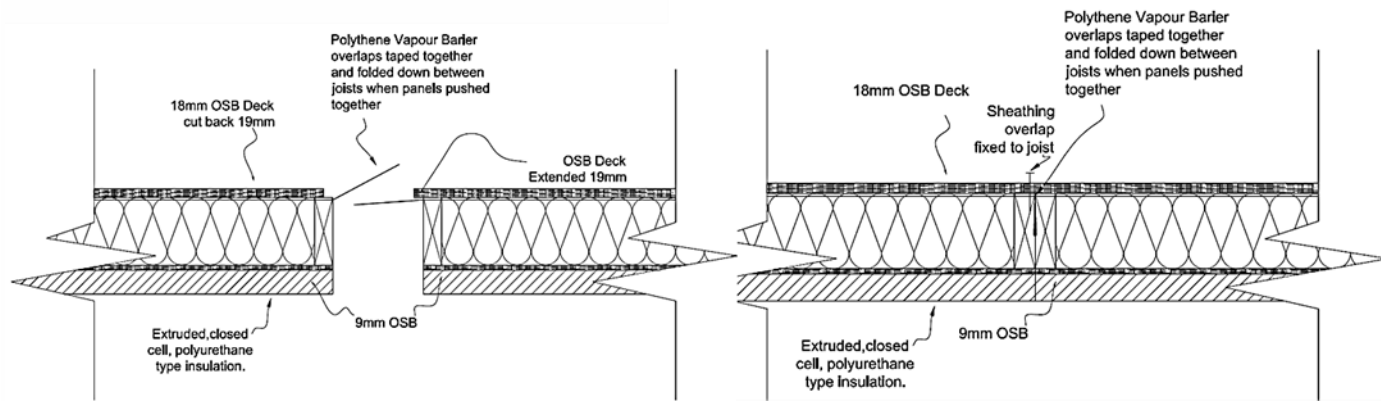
4: SupaFloor: Plan section at panel Junction before and after location (Larrosa Marshall and Associates, 2010)
